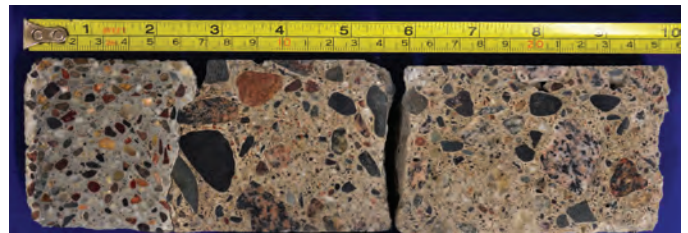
Extracted core from column which was previously repaired showing delamination in original concrete
